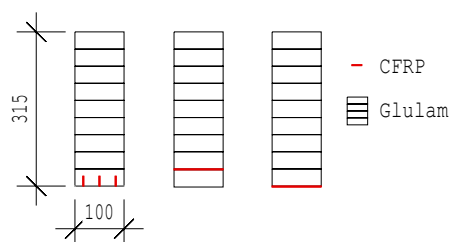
Cross sections of reinforced beams as tested by Blass et al. [14] (in the left beam the lamellas are slotted in; the beam in the centre has a facing lamella)
